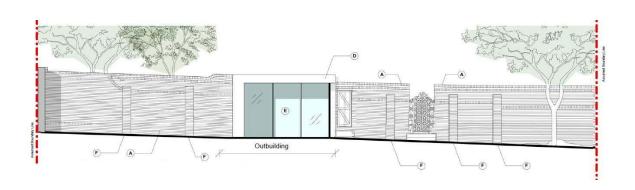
Proposed front elevation as viewed from No. 22 Frognal Way
